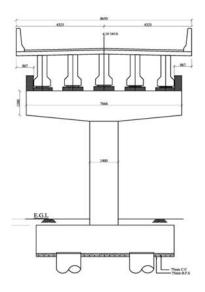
Roadway slab supported on prestressed I-girder, bent-cap and pier.
